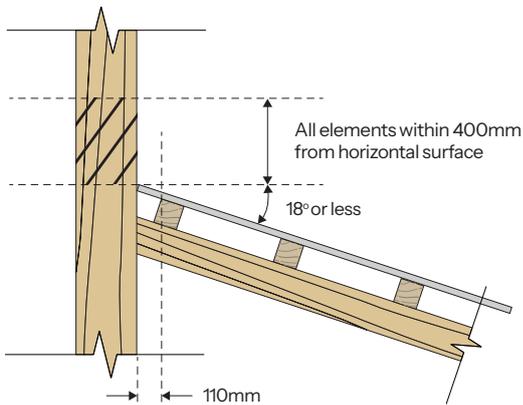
Construction requirements for external walls within 400mm of carport, veranda or awning roof.
